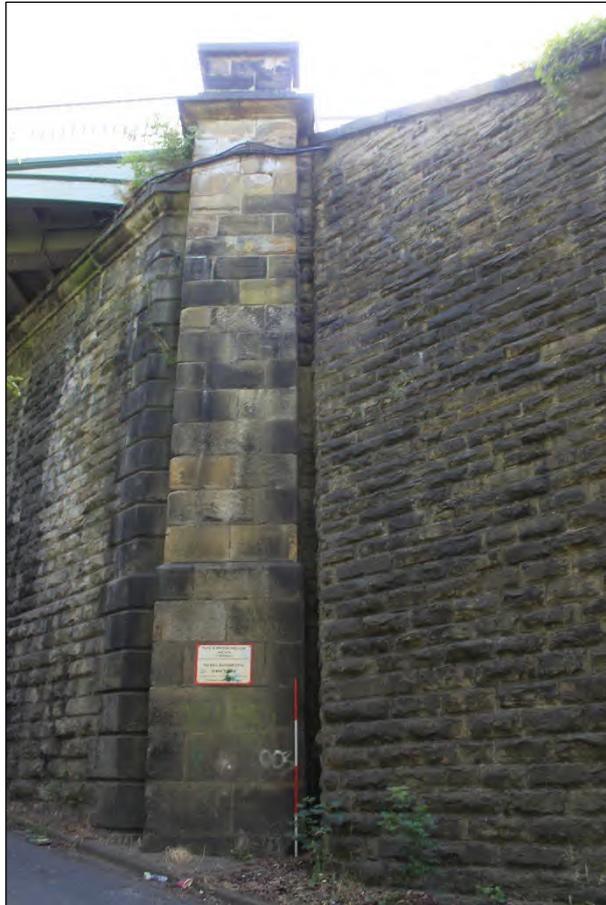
East elevation of Jack Lane Underbridge (MDL1/24), facing west-south-west, 2m scale (IMG\_1009)
